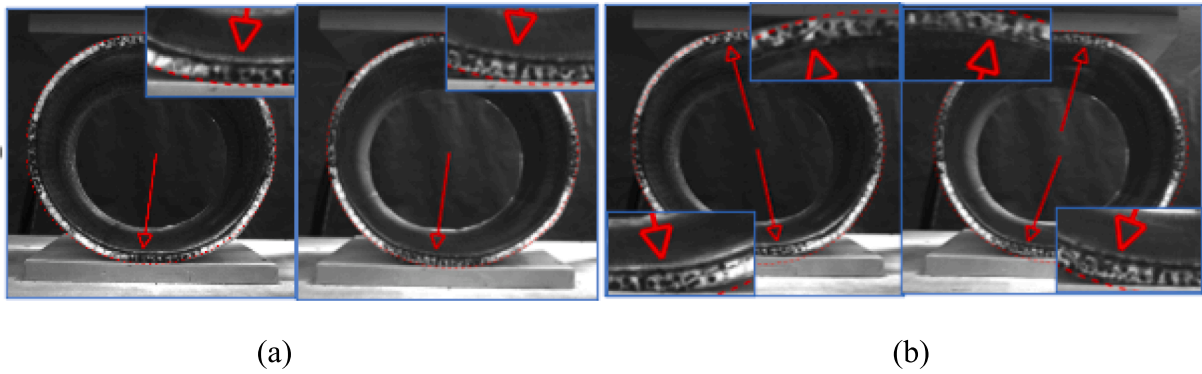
(a) 1st failure of FRP pipe samples; (b) 2nd failure of FRP pipe samples.
